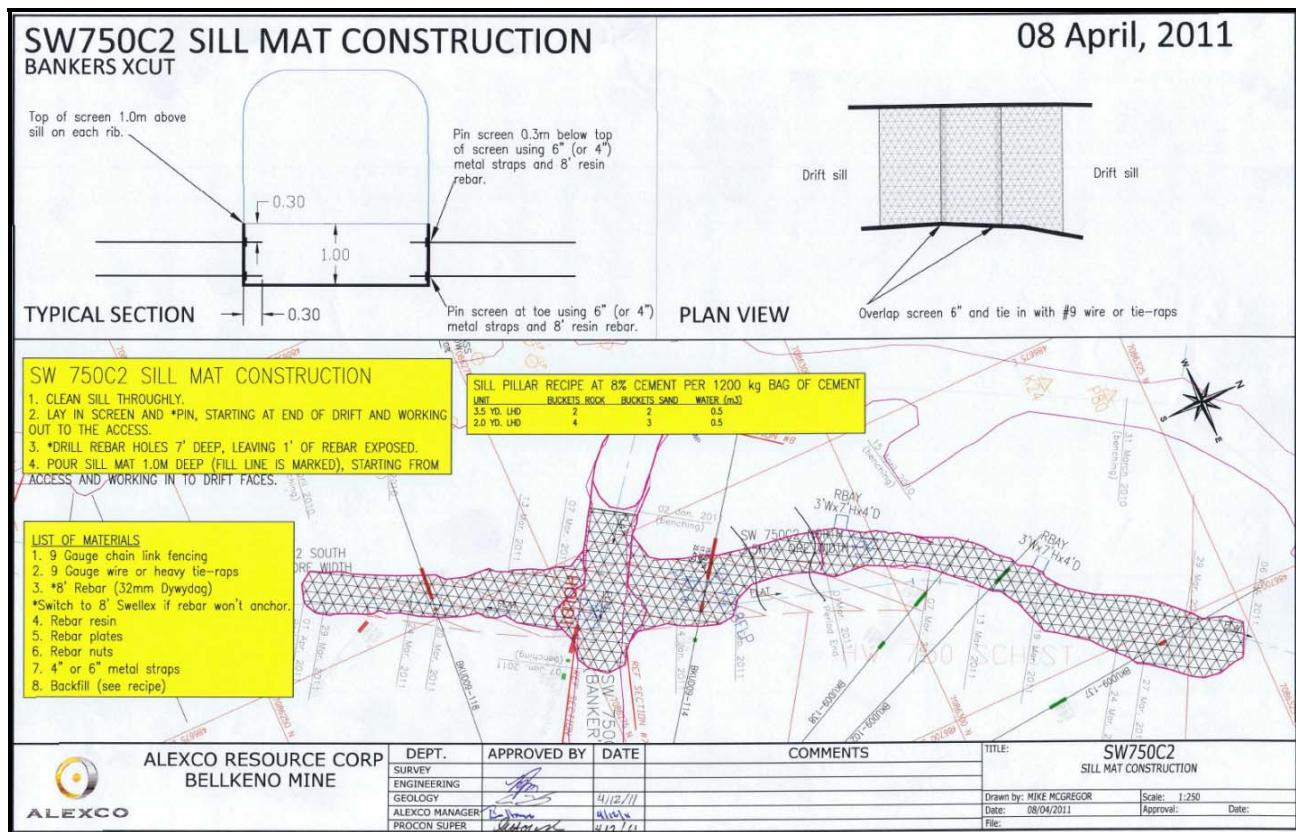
Sill Mat Installation Plan (Alexco, 2013)
